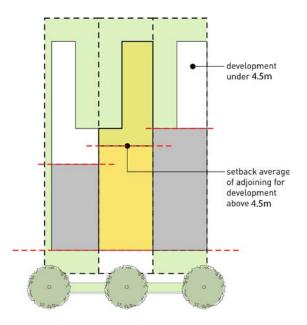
REAR SETBACK FOR FIRST FLOOR ON LOTS WITH A FRONTAGE LESS THAN 8.0M
